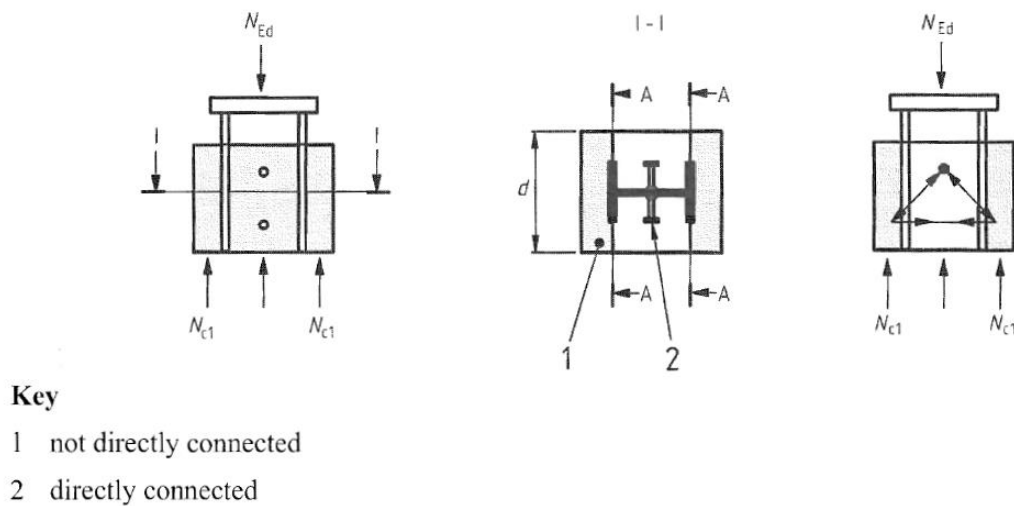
Direct and in-direct connected to concrete areas for the transverse design reinforcement
